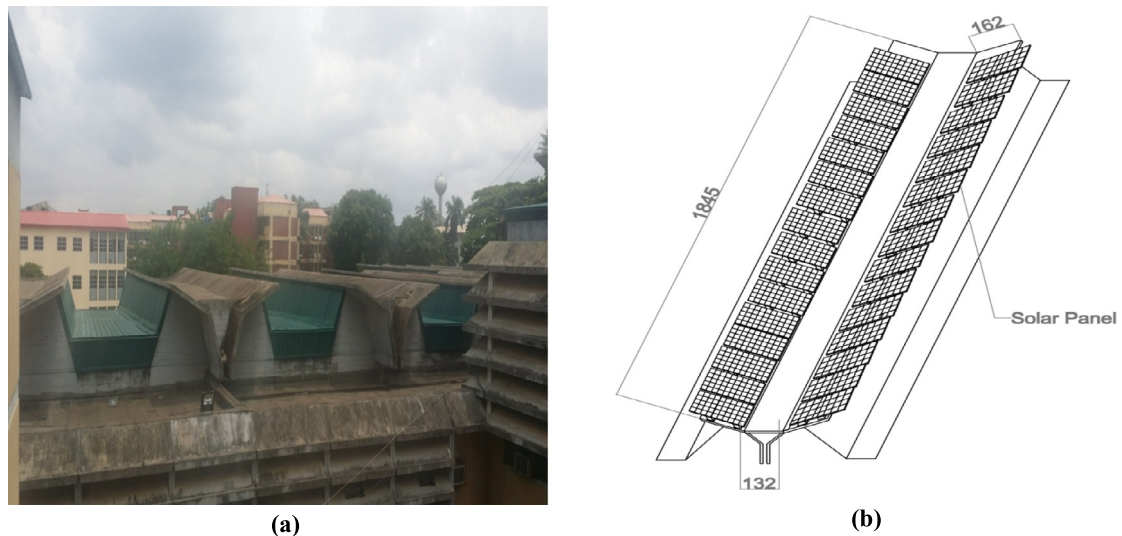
Proposed solar PV installation site, showing (a) the solar-ready roof of buildings at the Faculty of Engineering with wings; and (b) the dimension of one of the wings.
